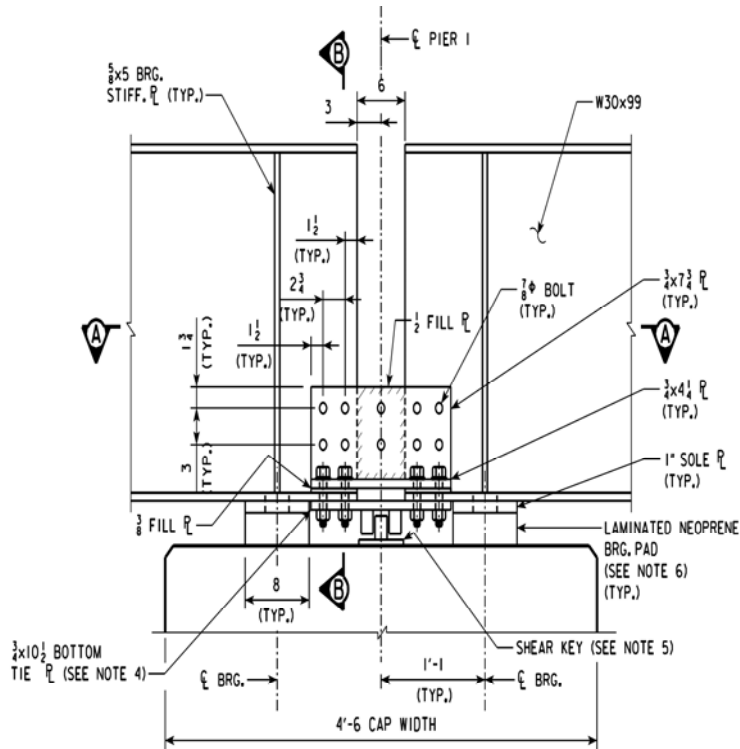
Structural steel connection between adjacent spans (precast deck not shown)
